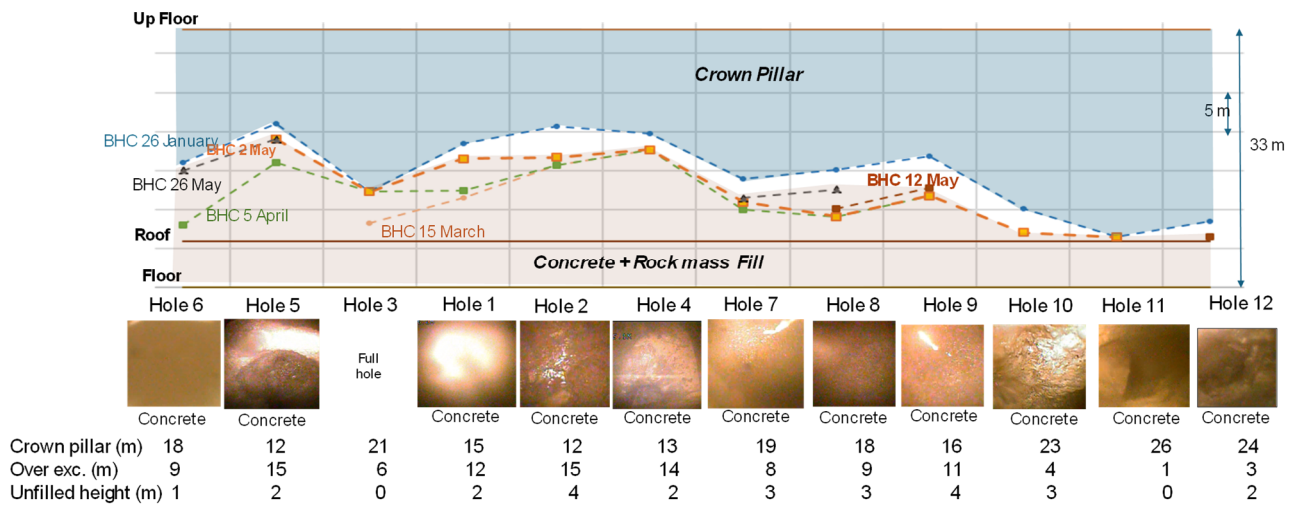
Section showing the elevation of concrete at the end of the backfill process
